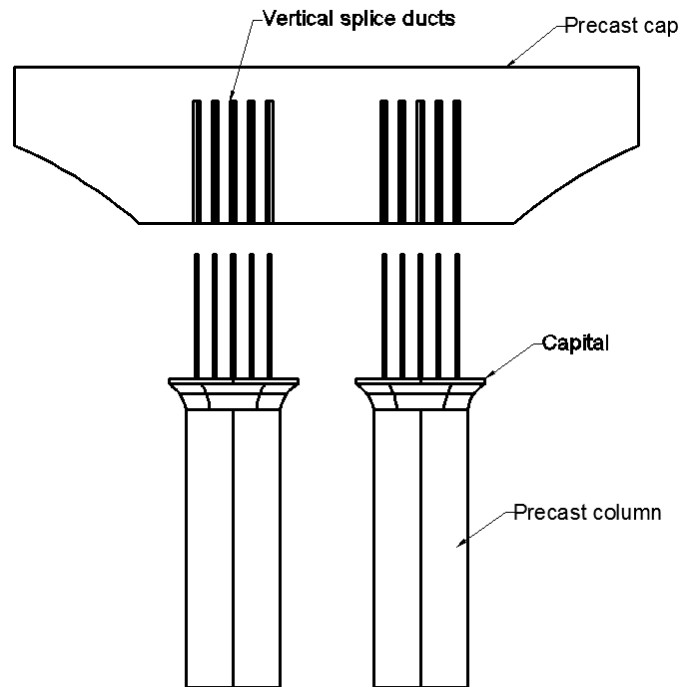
Grouted corrugated duct connection for precast bent cap to precast concrete column
